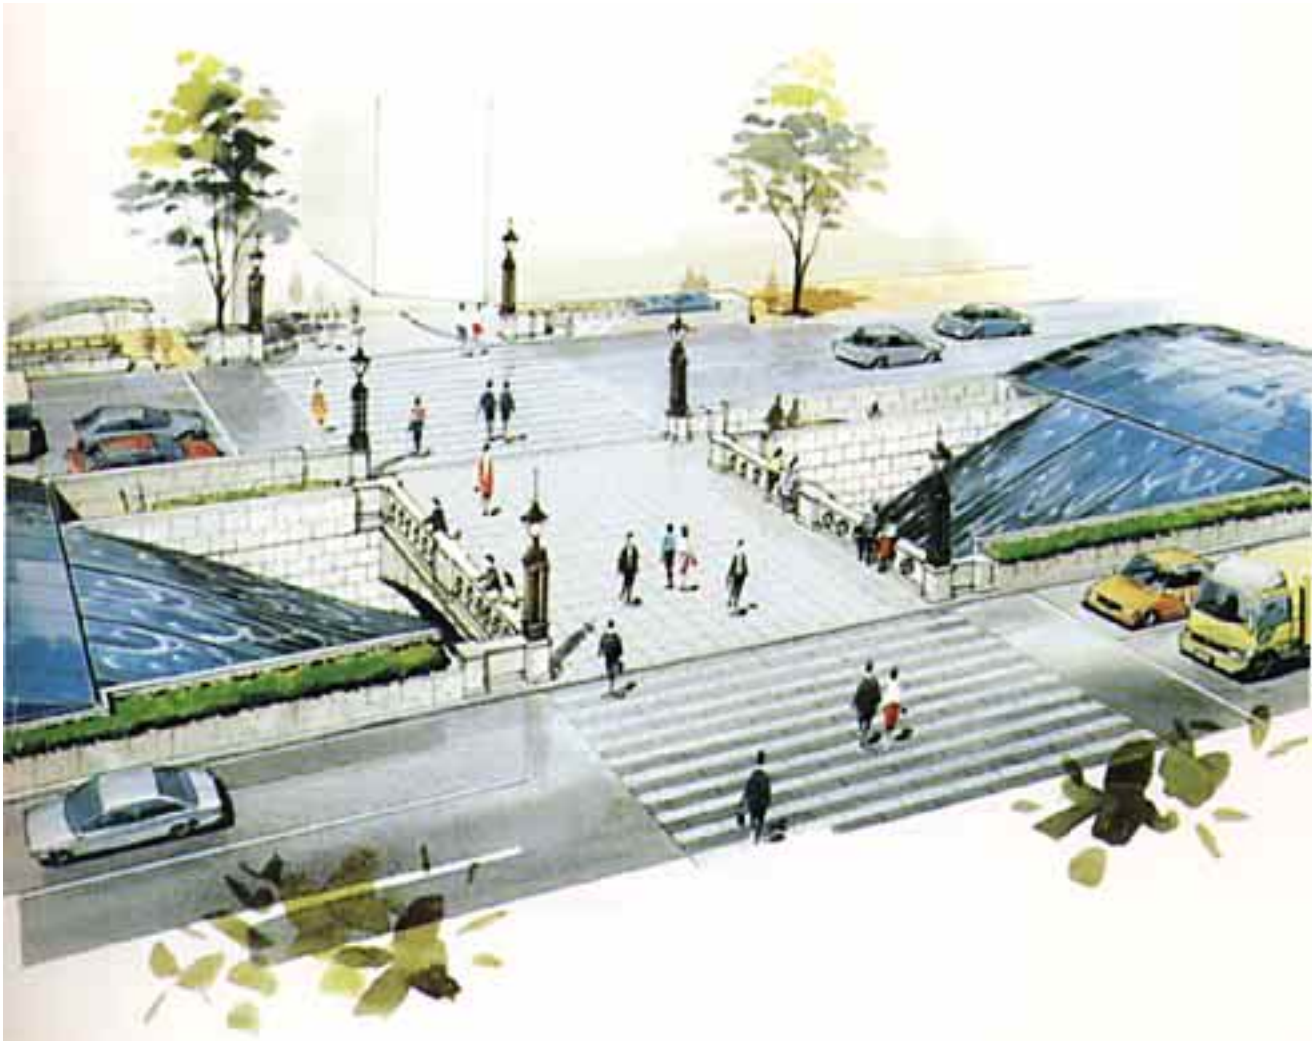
Current Shinsaibashi Bridge Modeled after Bridge Constructed in 1909
